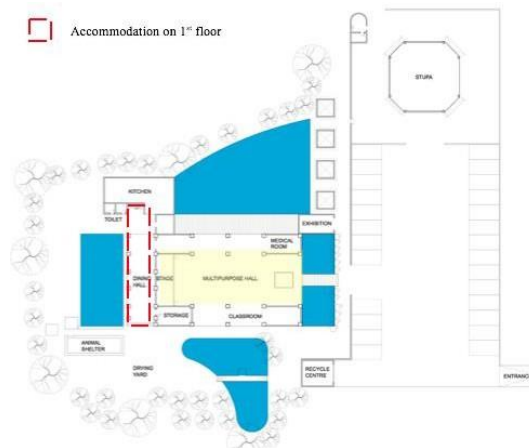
Ground floor plan of Bodhi Homecare Centre showing the layout of spaces surrounded the multipurpose hall
